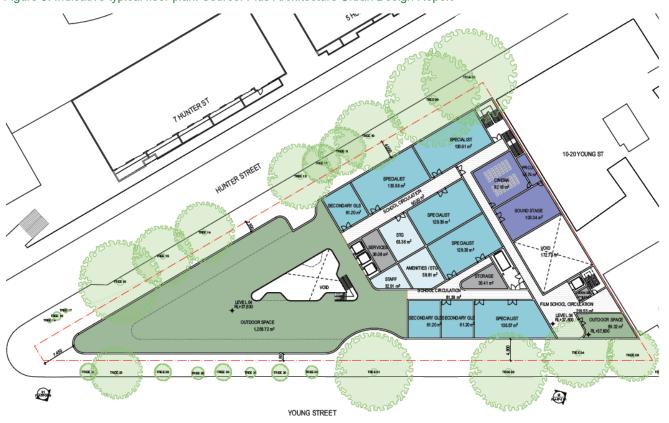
Indicative floor plan level 4. Source: Plus Architecture Urban Design Report
